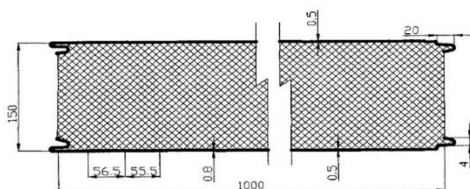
The geometrical dimensions of the wall panel of the “AluTerm” series (cross section) submitted for testing.
